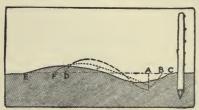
Showing forms of ditch beside a fence line, as at the side of a public highway. A-D, ditch made with steep bank and dirt left in high ridge. B-F, ditch made with slanting outer bank and ridge rounded down. C-E, ditch rounded and earth spread out so that land can be mowed or even cultivated to the roadway, as at F.
